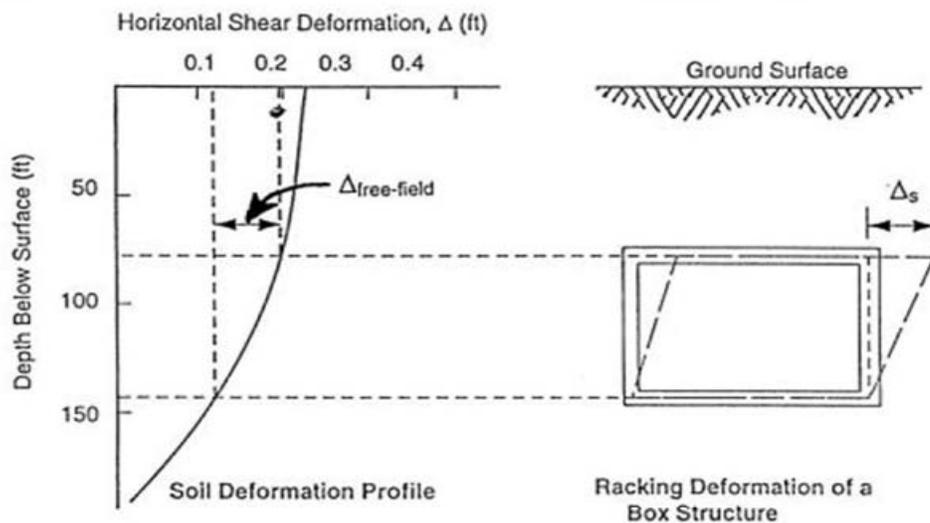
Soil Deformation Profile and Racking Deformation of a Box Structure
